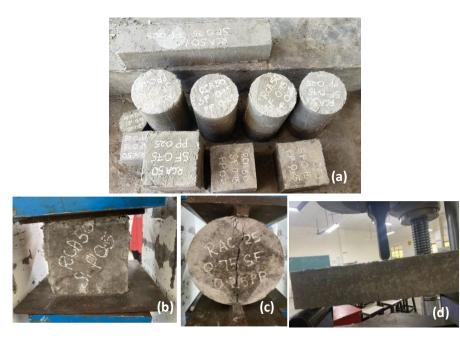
(a). Cast specimens and (b-d) testing HFRAC specimens
